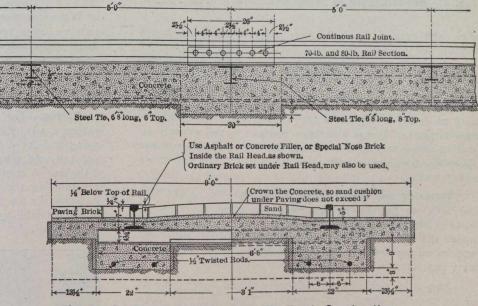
Section of Concrete Steel Tie Track Construction.
